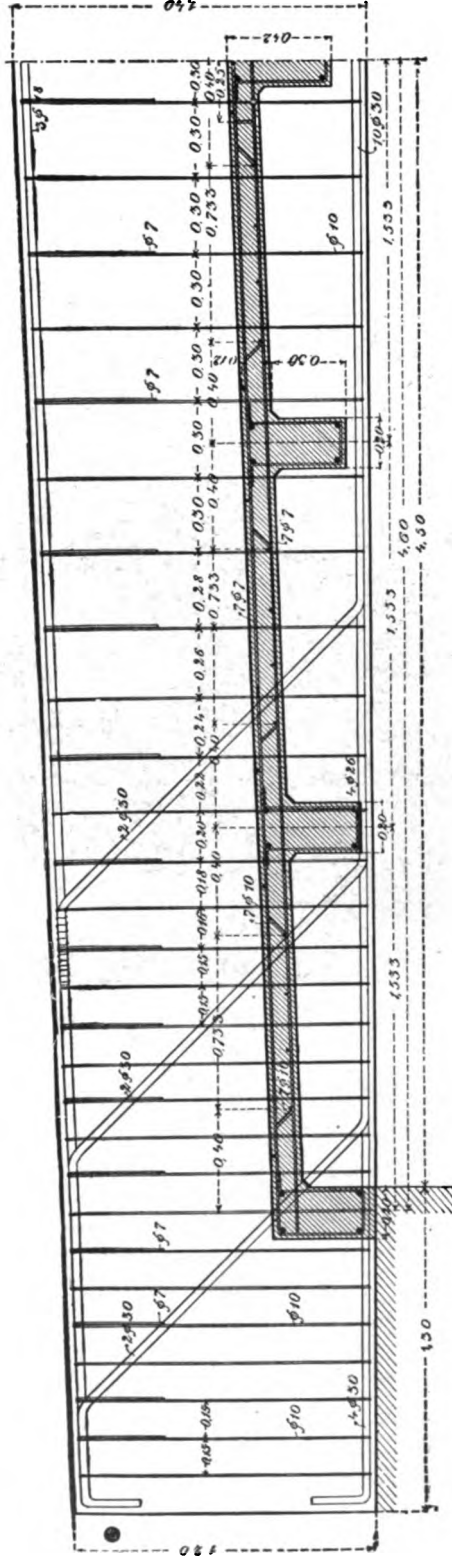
Highway Bridge at Grimmelfingen. Longitudinal section. Detail of the deck and the main girders.
